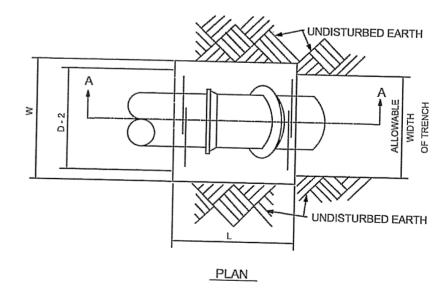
CONCRETE THRUST BLOCK DETAILS FOR RESTRAINED JOINT PIPE
